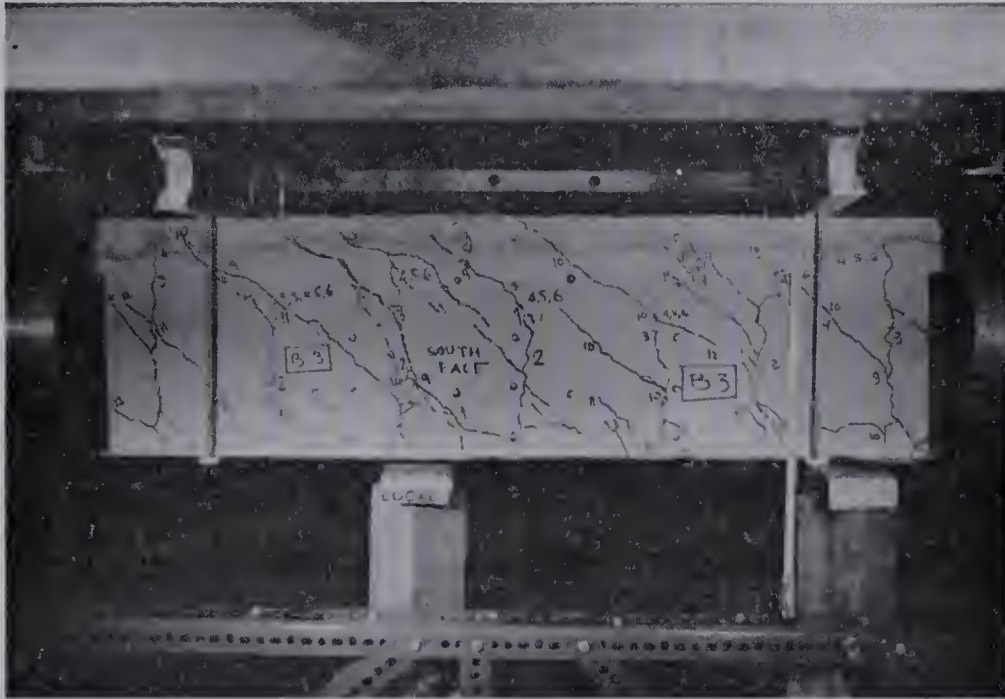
CRACK PATTERN FOR SOUTH FACE OF BEAM B-3
